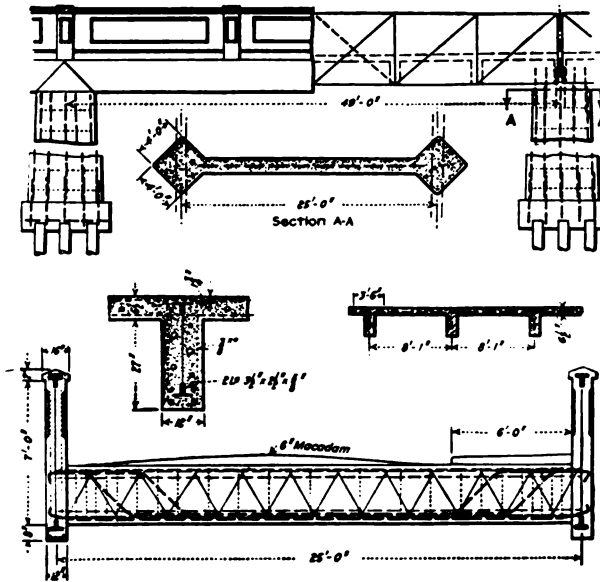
Details of bridge over Muddy Creek, Hamilton County, Ohio
